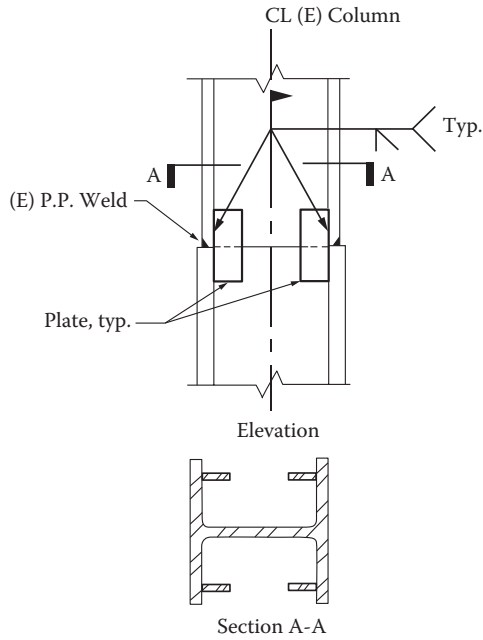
Welded splice upgrade at existing column.
